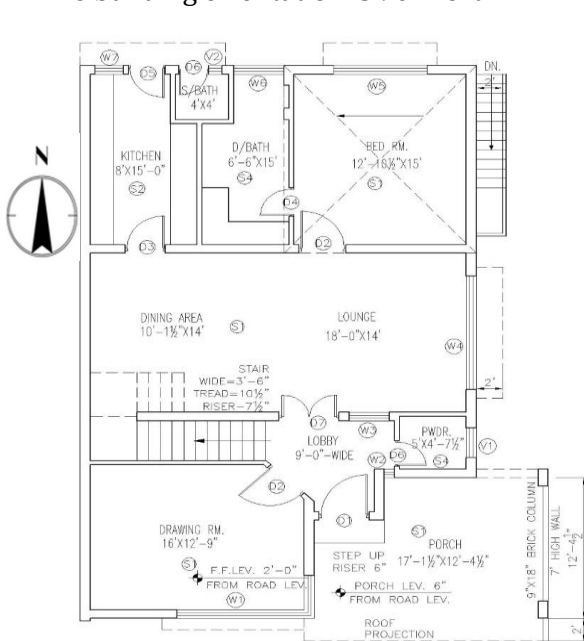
Ground floor level of Base case building (Source: Arch Sol, 44L commercial street floor DHA Phase 8)
